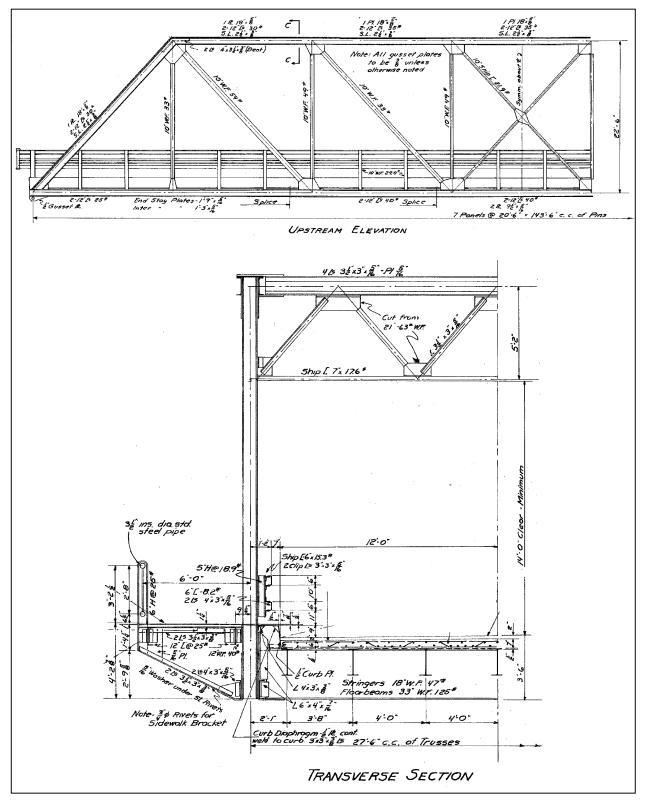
Pratt thru truss elevation and section drawings (Source NHHD 1936, Bridge Drawings, Sheet 11 of 21; NHDOT Digital File 50146POP010.tif).
